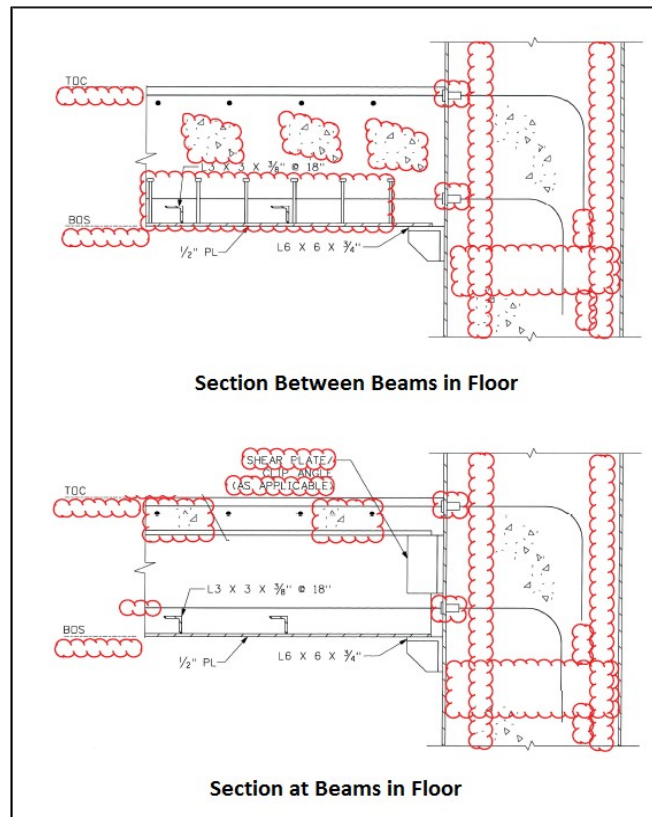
Elevation View of CA37 Floor to CA01 Wall Connection
